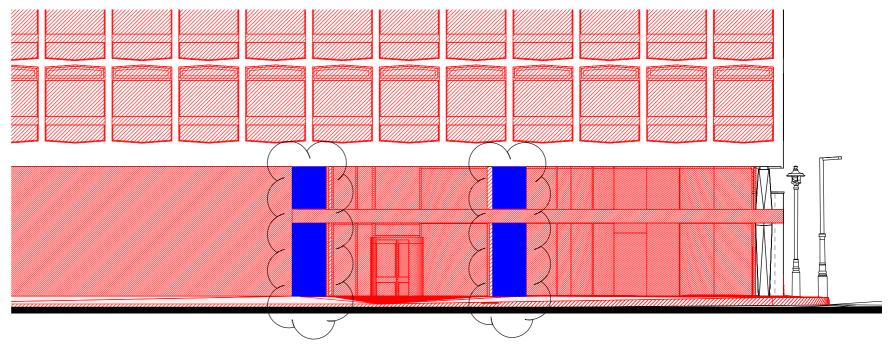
Proposed Amendments - Consented East Elevation Demolition
